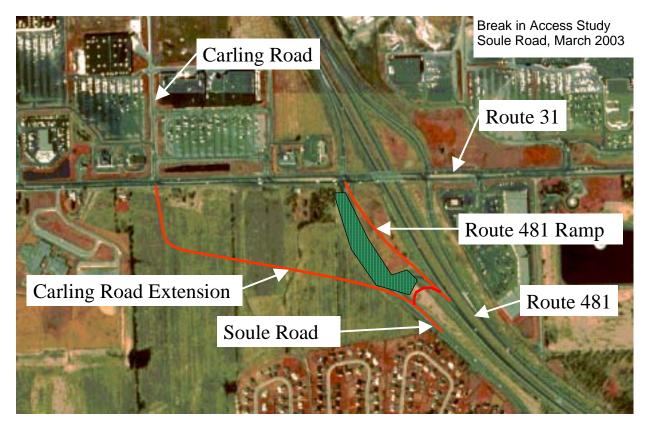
Alternative 3 – Separate Soule Road with ramp to Route 481
